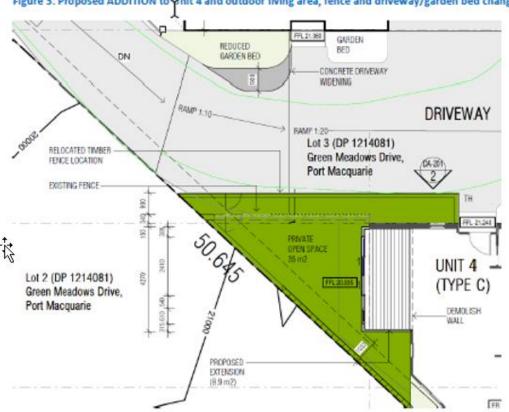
Proposed ADDITION to vinit 4 and outdoor living area, fence and driveway/garden bed change
